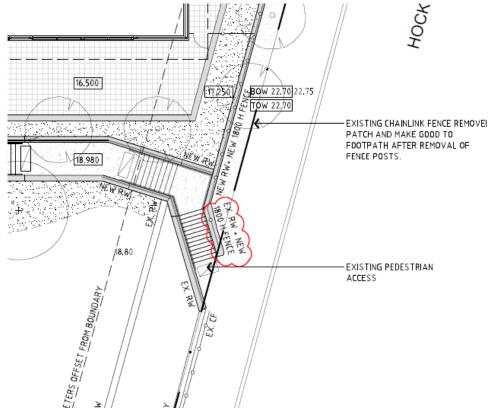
Extract of Plan DA.03 showing the modifications to the plans regarding the fencing shown in a red cloud
